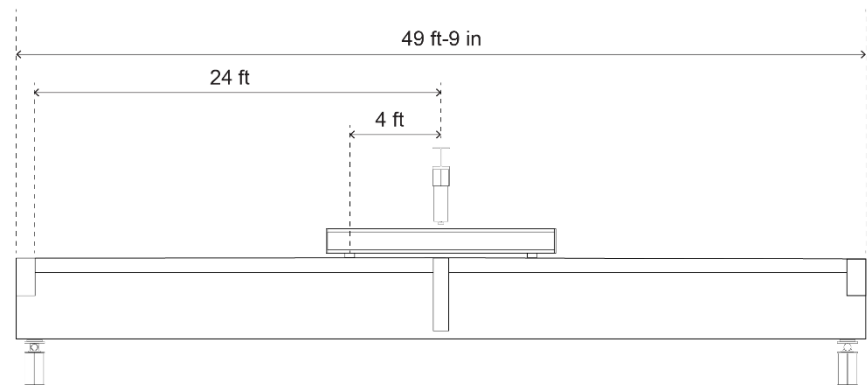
Flexural Testing Setup for Lesner Bridge I-Beams
